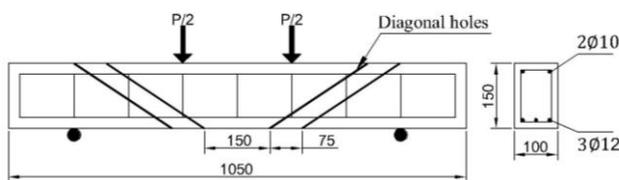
Test Specimens of Groups (4 and 5) (Reinforced concrete beam internally injected by epoxy)
